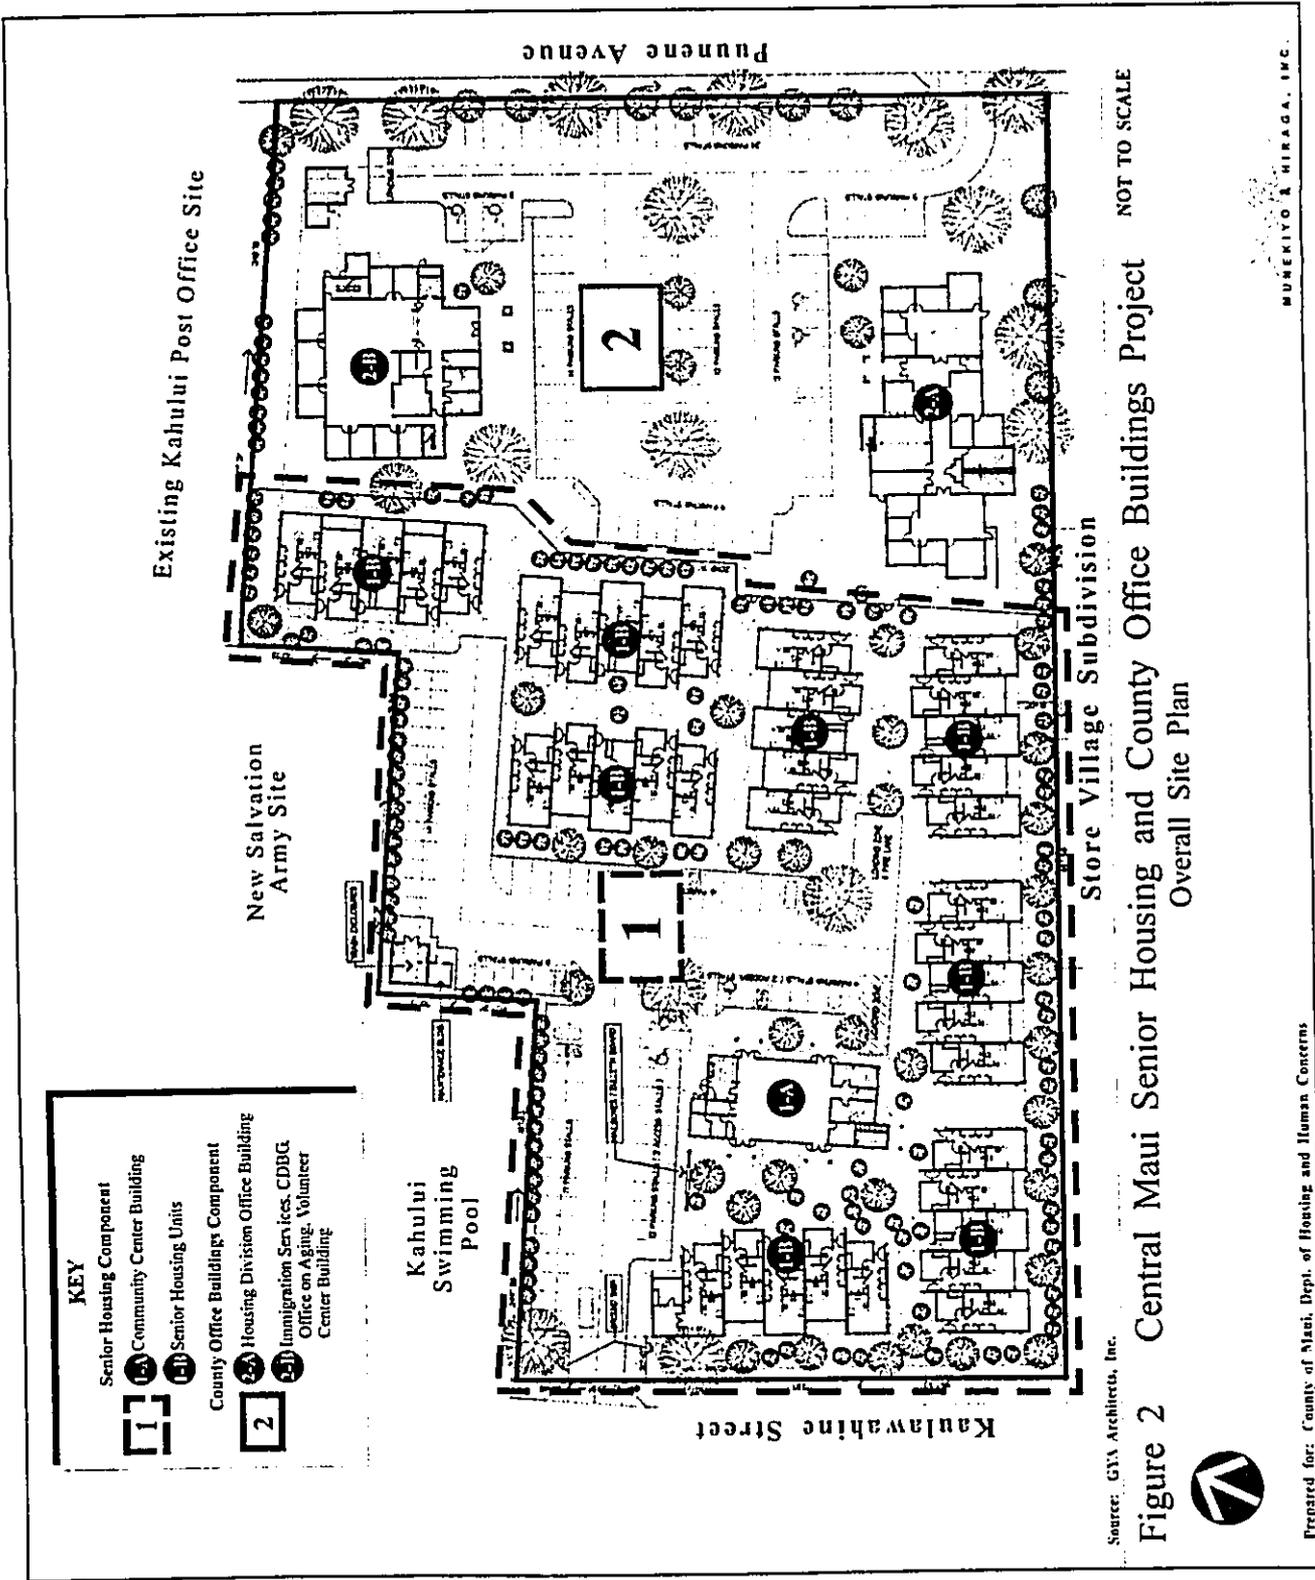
Central Maui Senior Housing and County Office Buildings Project Overall Site Plan
